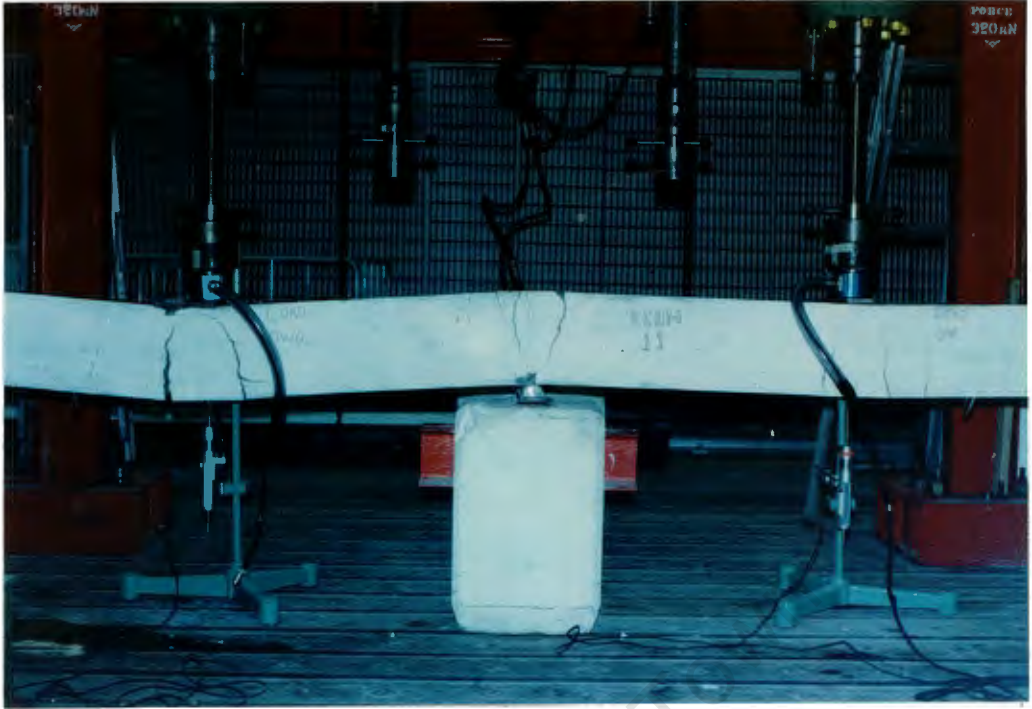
Beam FSII at failure. The beam failed in the left span and over the interior support.
